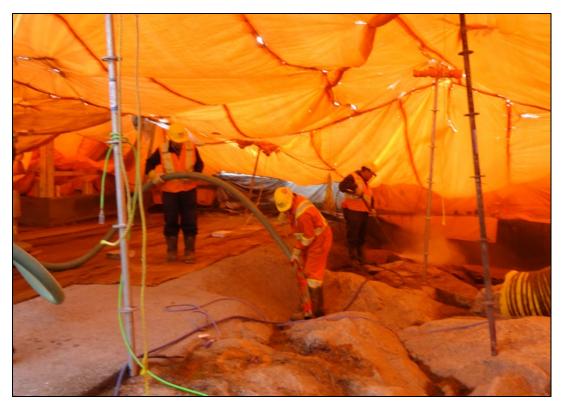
Powerhouse north service bay foundation. Cleaning the rock surface with an air vacuum and water jet. (November 26, 2014)
